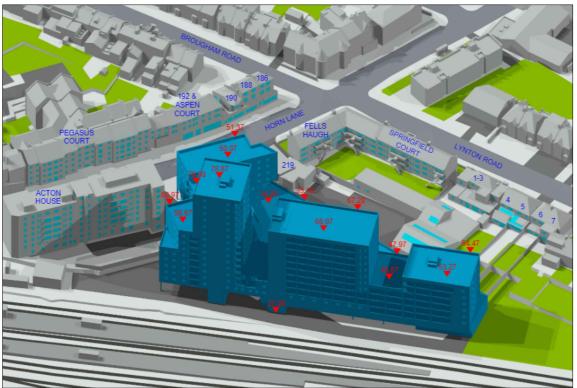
Proposed Development with windows tested against BRE Guidance Page 35 of 74
